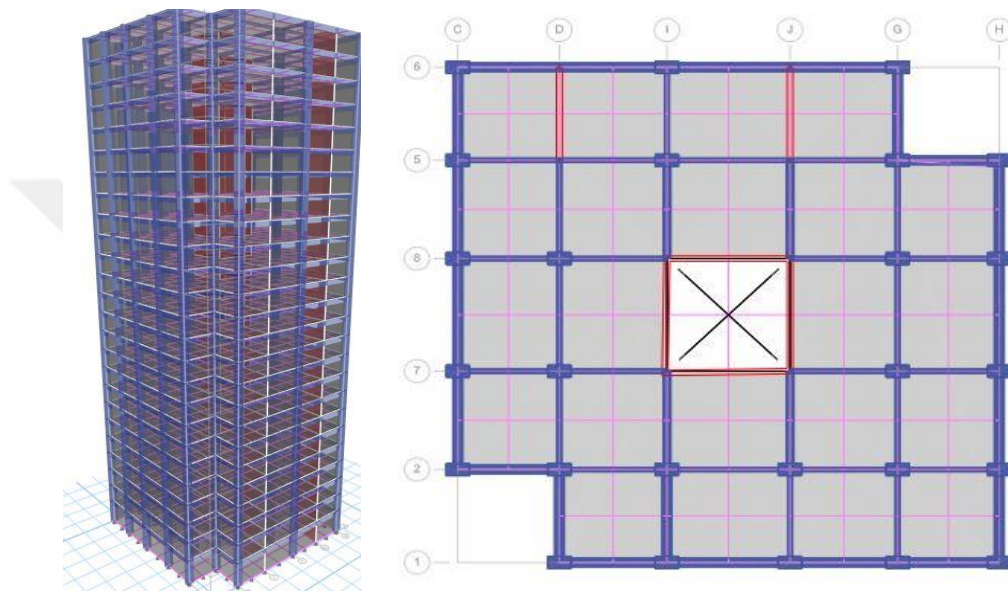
Conventional Floor Model Isometric & Plan View Model (6.3-5.5-5.2).
